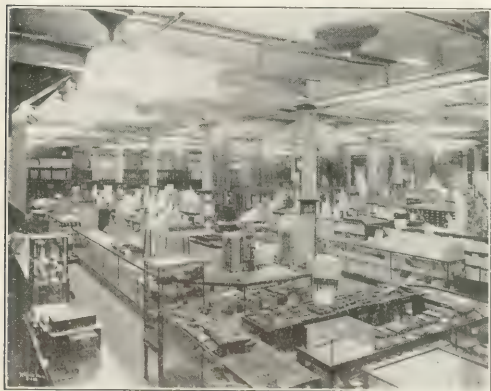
INDIRECT LIGHTING ON FIRST FLOOR
